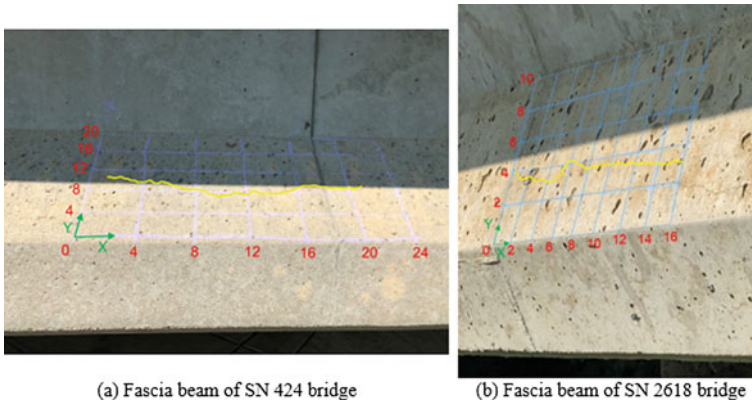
Data collection on two prestressed concrete I-beams with a longitudinal crack (yellow line shows the longitudinal crack.)
